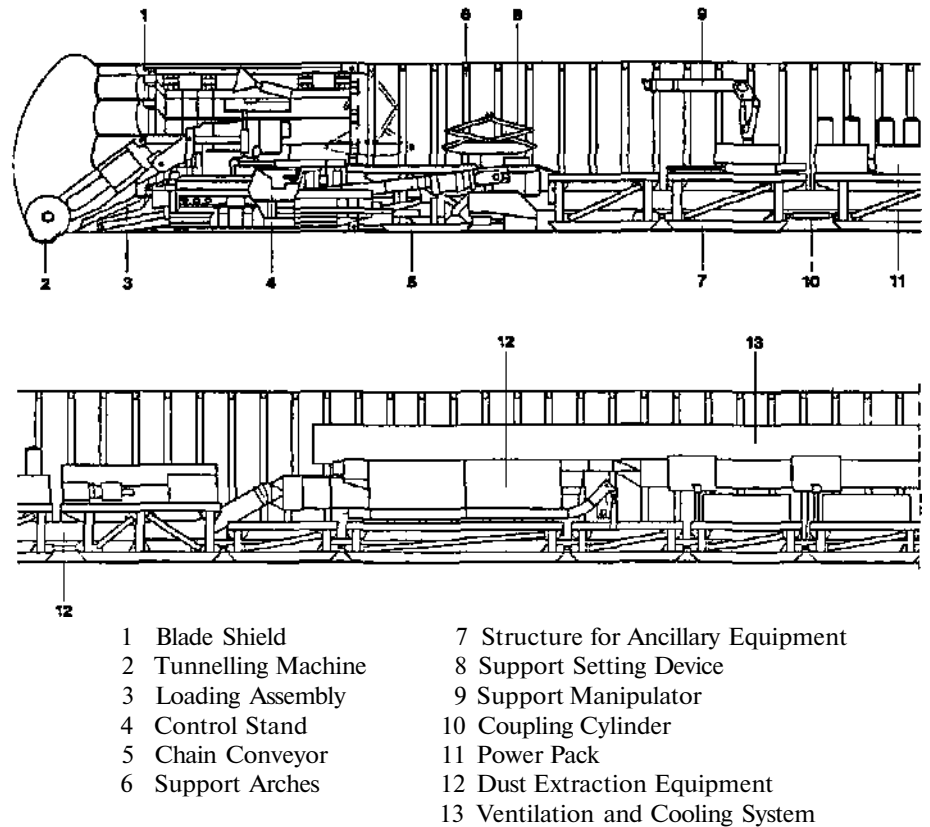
Complete mechanized roadway driving system with shield and tunnelling machine.
